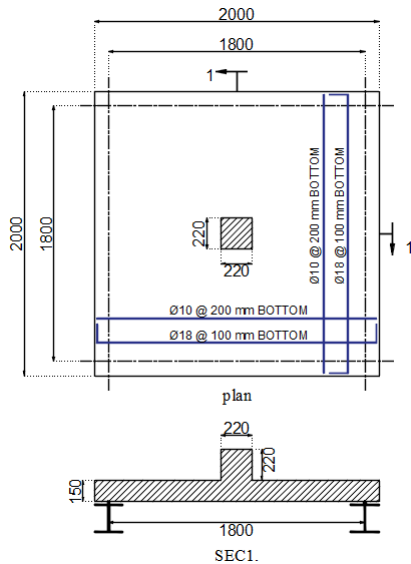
Specimen with Column Aspect Ratio 1:1 (Dimensions in mm)
